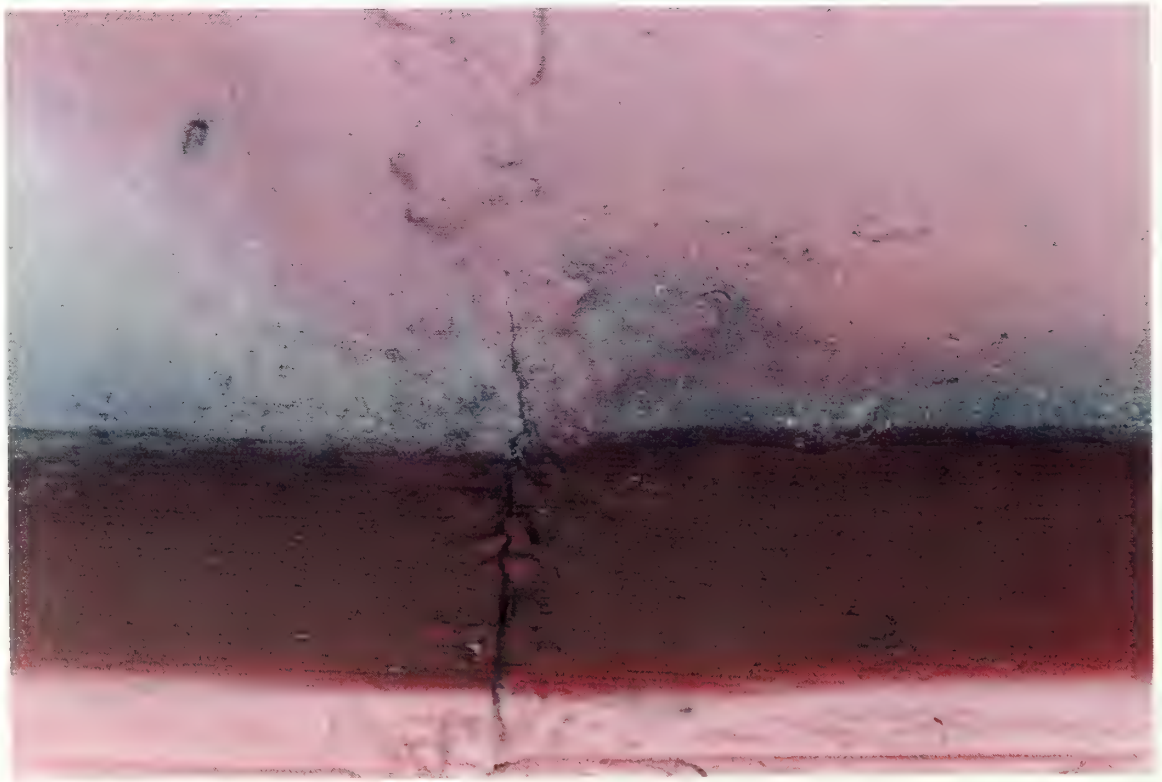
Close-up view of a soldered seam in the flat roofing at the diverter showing how the lack of expansions joints has caused the joint to fail.
